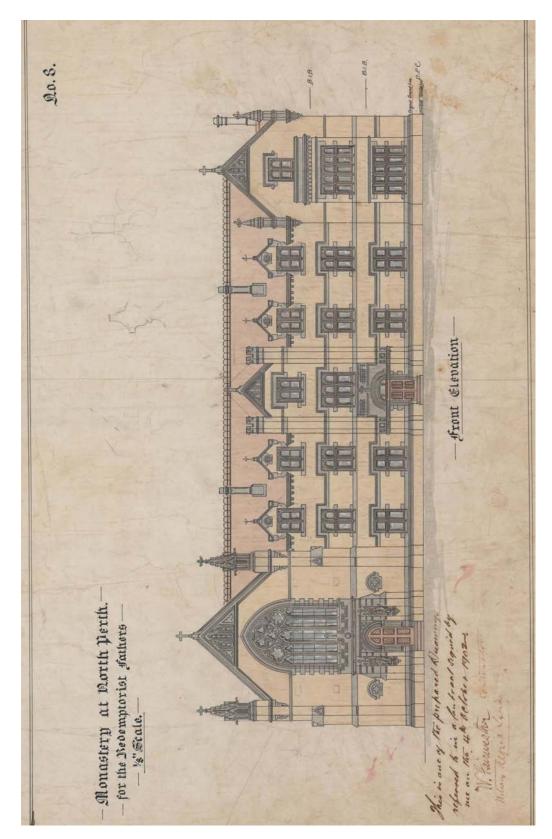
'Monastery at North Perth for the Redemptorist Fathers', Front Elevation, No.8, c.1903. The construction appears to have followed the elevation closely, with minor changes, such as fenestration to the eastern bay window and the proportion of and clock to the central entrance bay. Plan courtesy of the Redemptorist Fathers.
